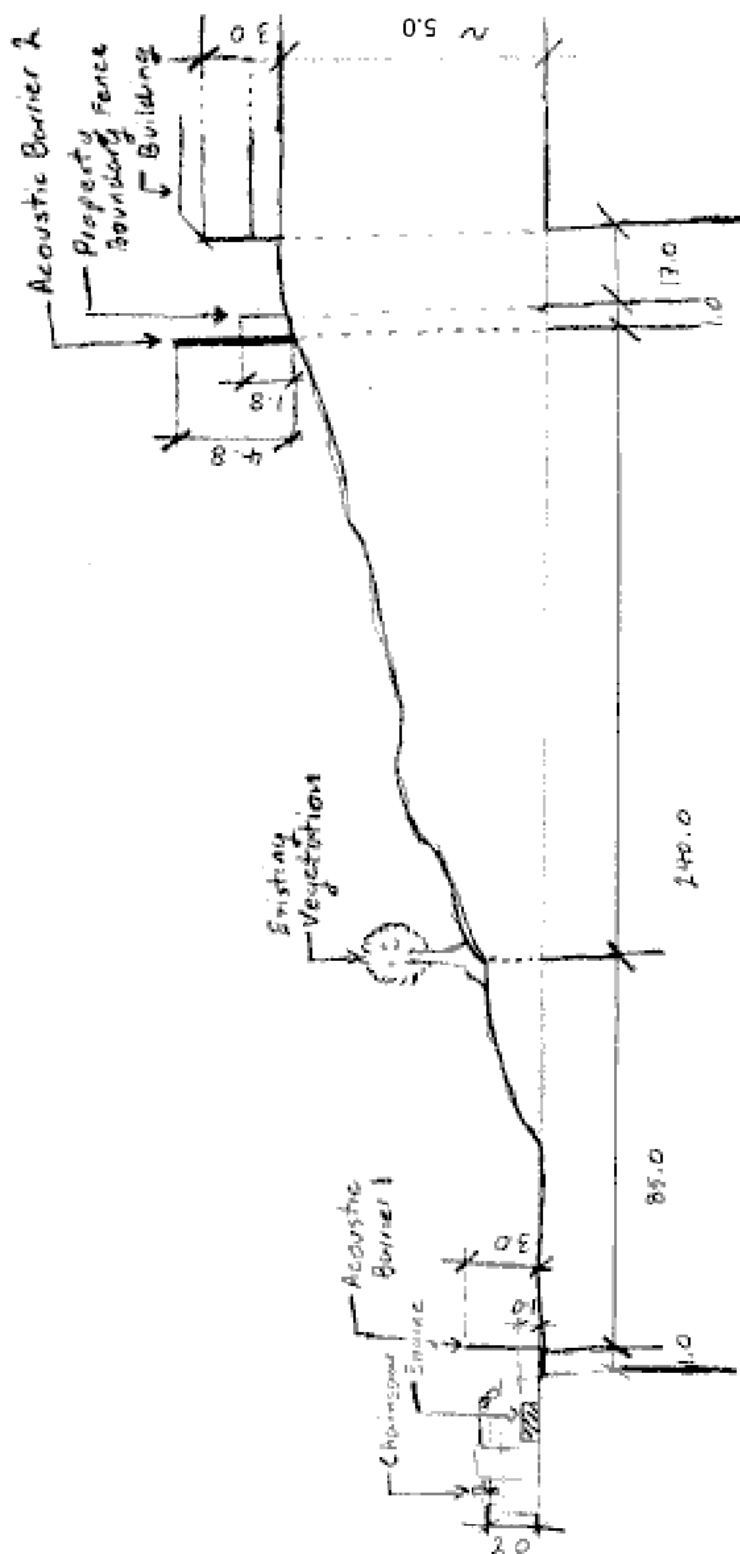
Positioning of both Stage 1 and 2 acoustic barriers – not to scale
